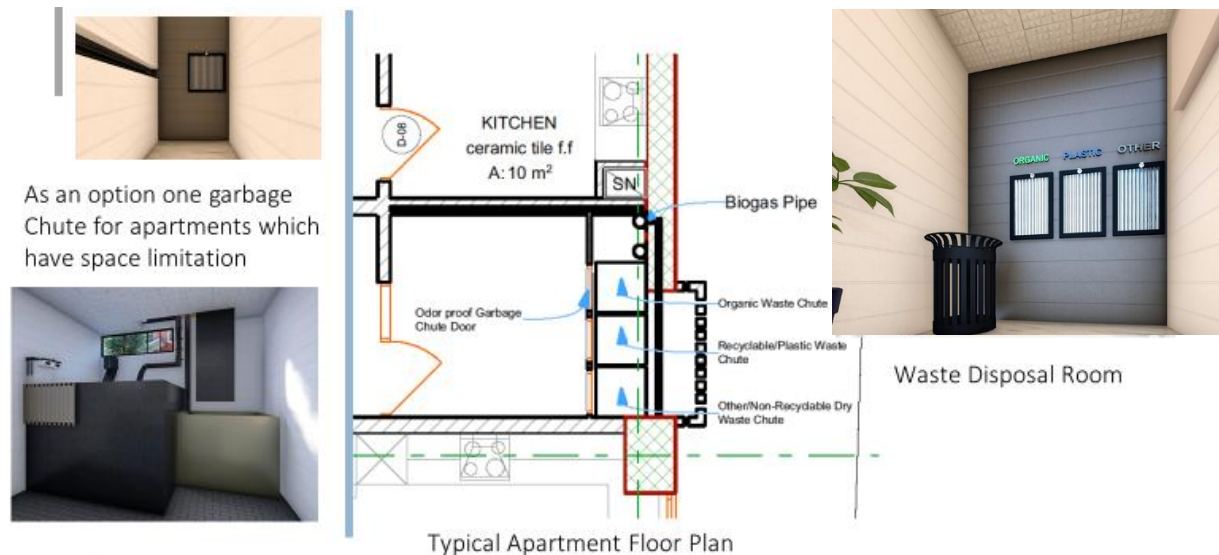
Typical Apartment Floor Plan with Garbage chute Integration and Waste Disposal Layout
